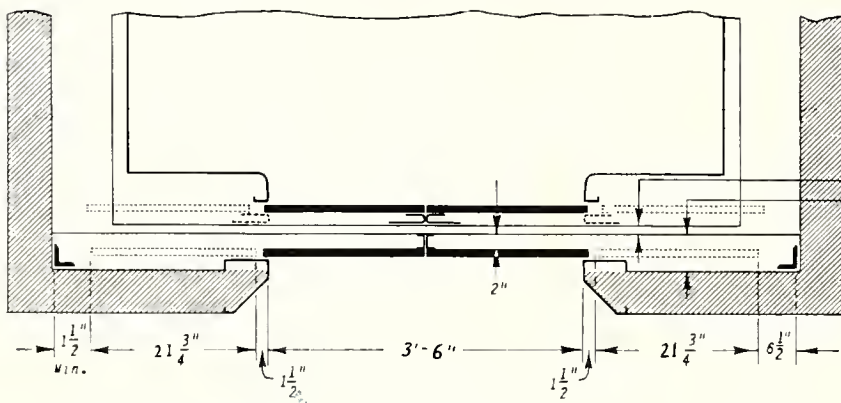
A layout illustrating center opening car and hoistway doors. This door arrangement requires more space for installation than other types, but provides superior service. It is usually applied to clear door openings of greater than 3'-0".
